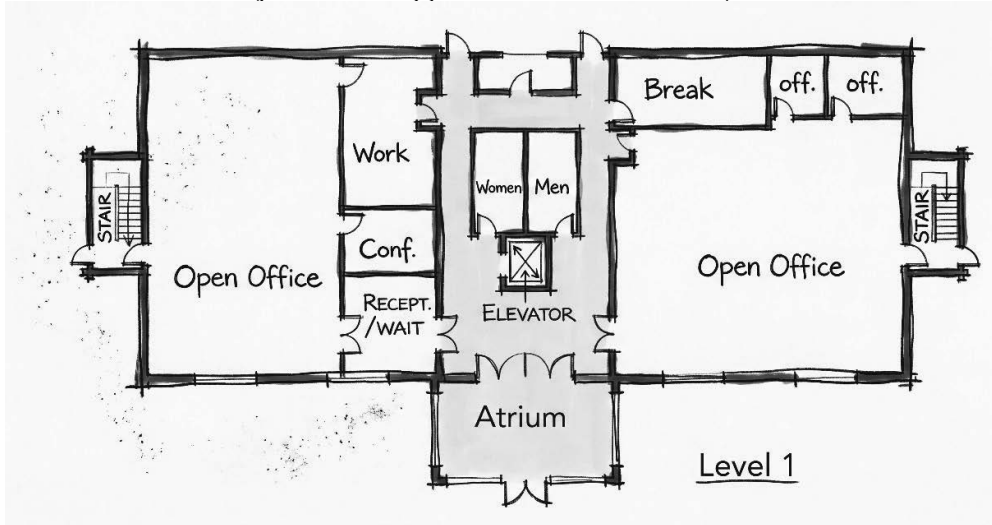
Level 1 floor plan preliminary concept sketch
